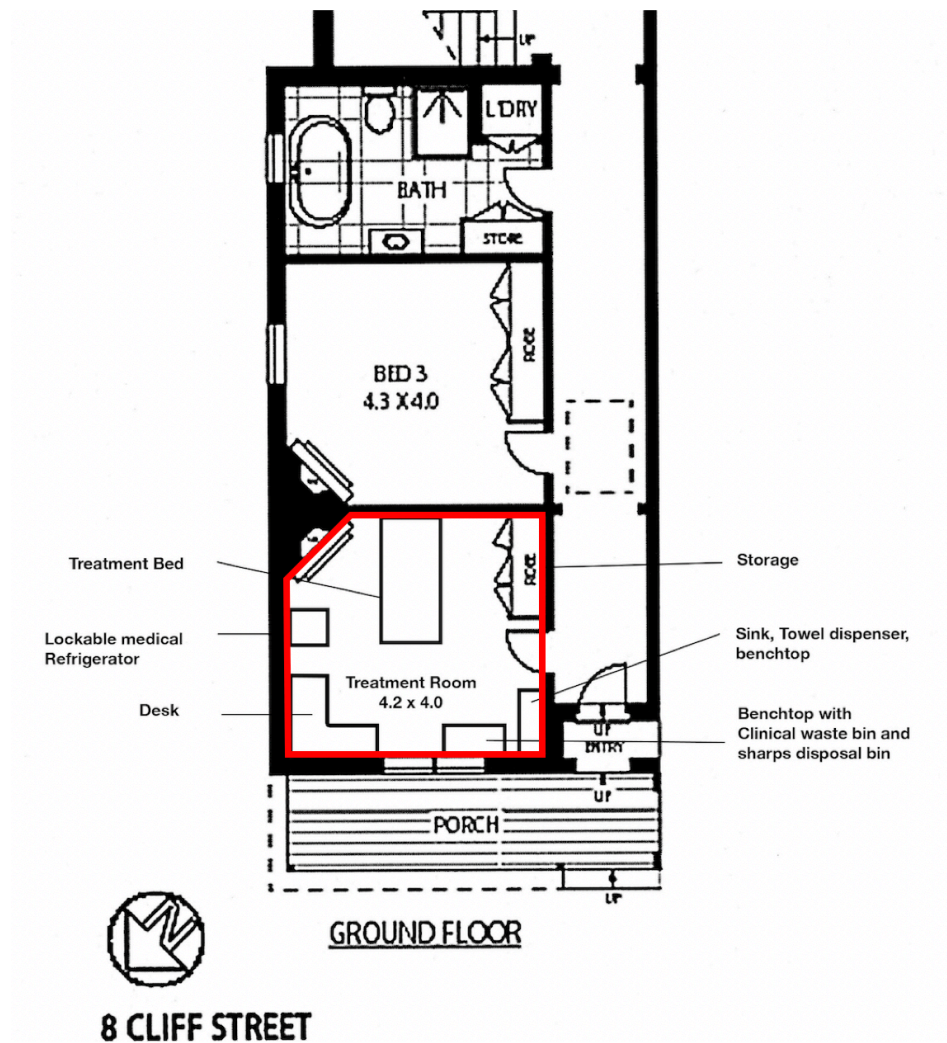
Proposed location and fitout of beauty treatment room (Source: Proposed Ground Floor Plan Drawing DA01 by Rosalind Dunphy)
